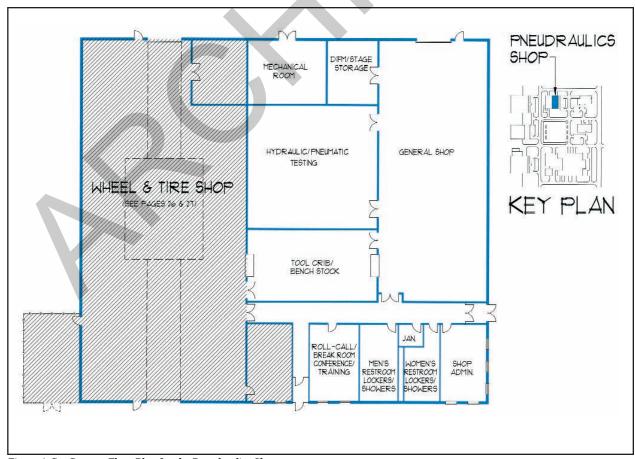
G: Concept Floor Plan for the Pneudraulics Shop.
